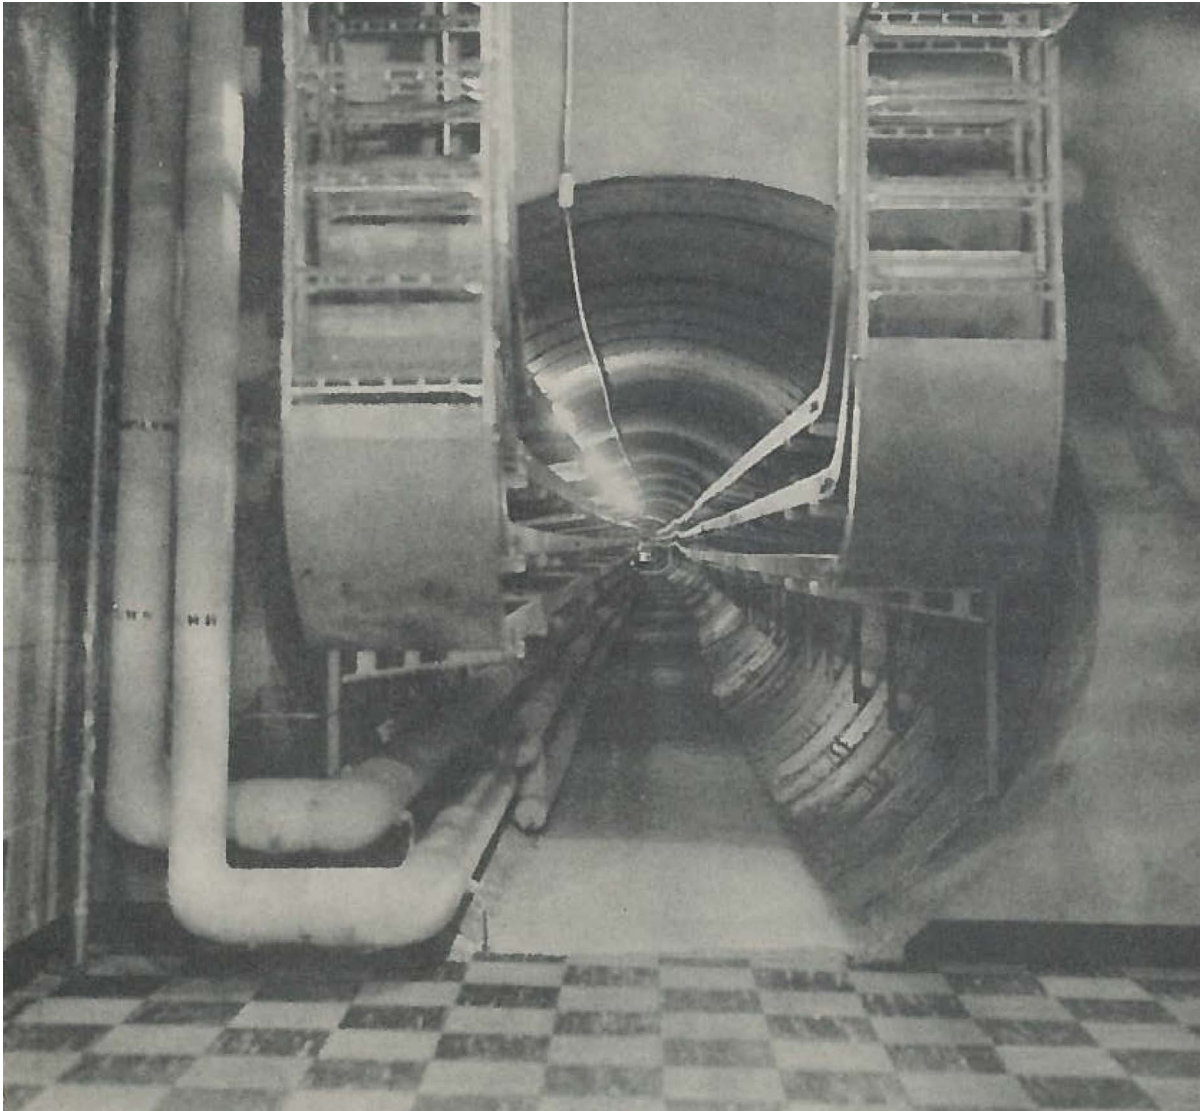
Photo of the tunnel soon after it was constructed (*adapted from WSMR 1959*).
